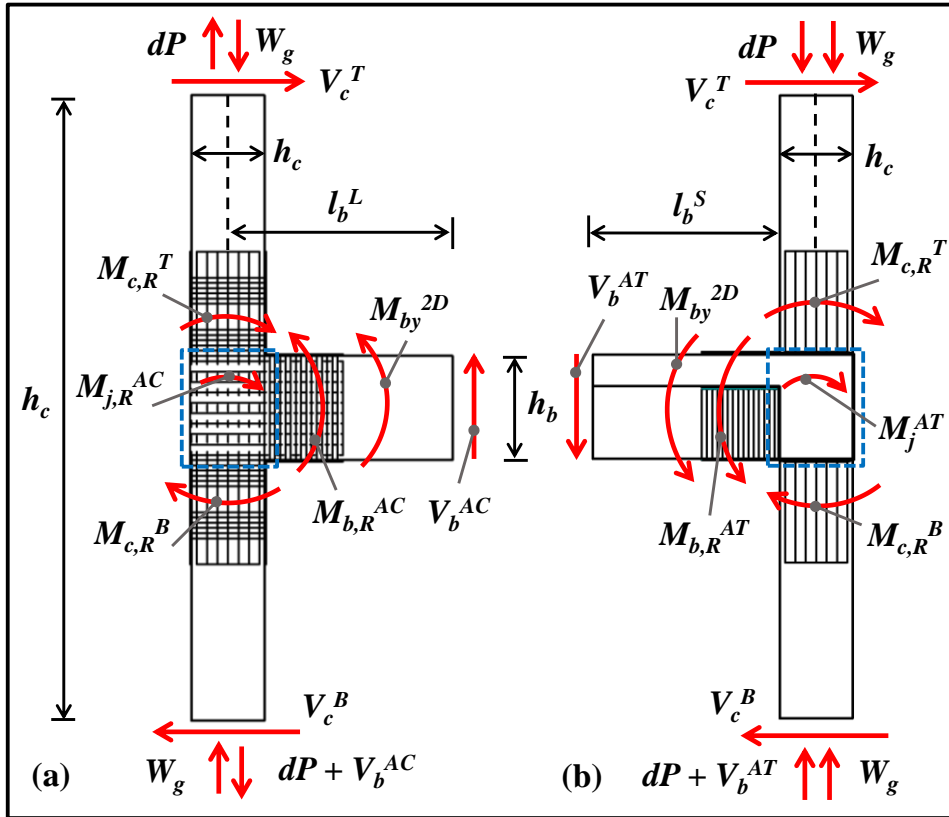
Actions and resisting forces in (a) corner long span beam column joint AC situation, and (b) cruciform short span beam column joint AT situation.
